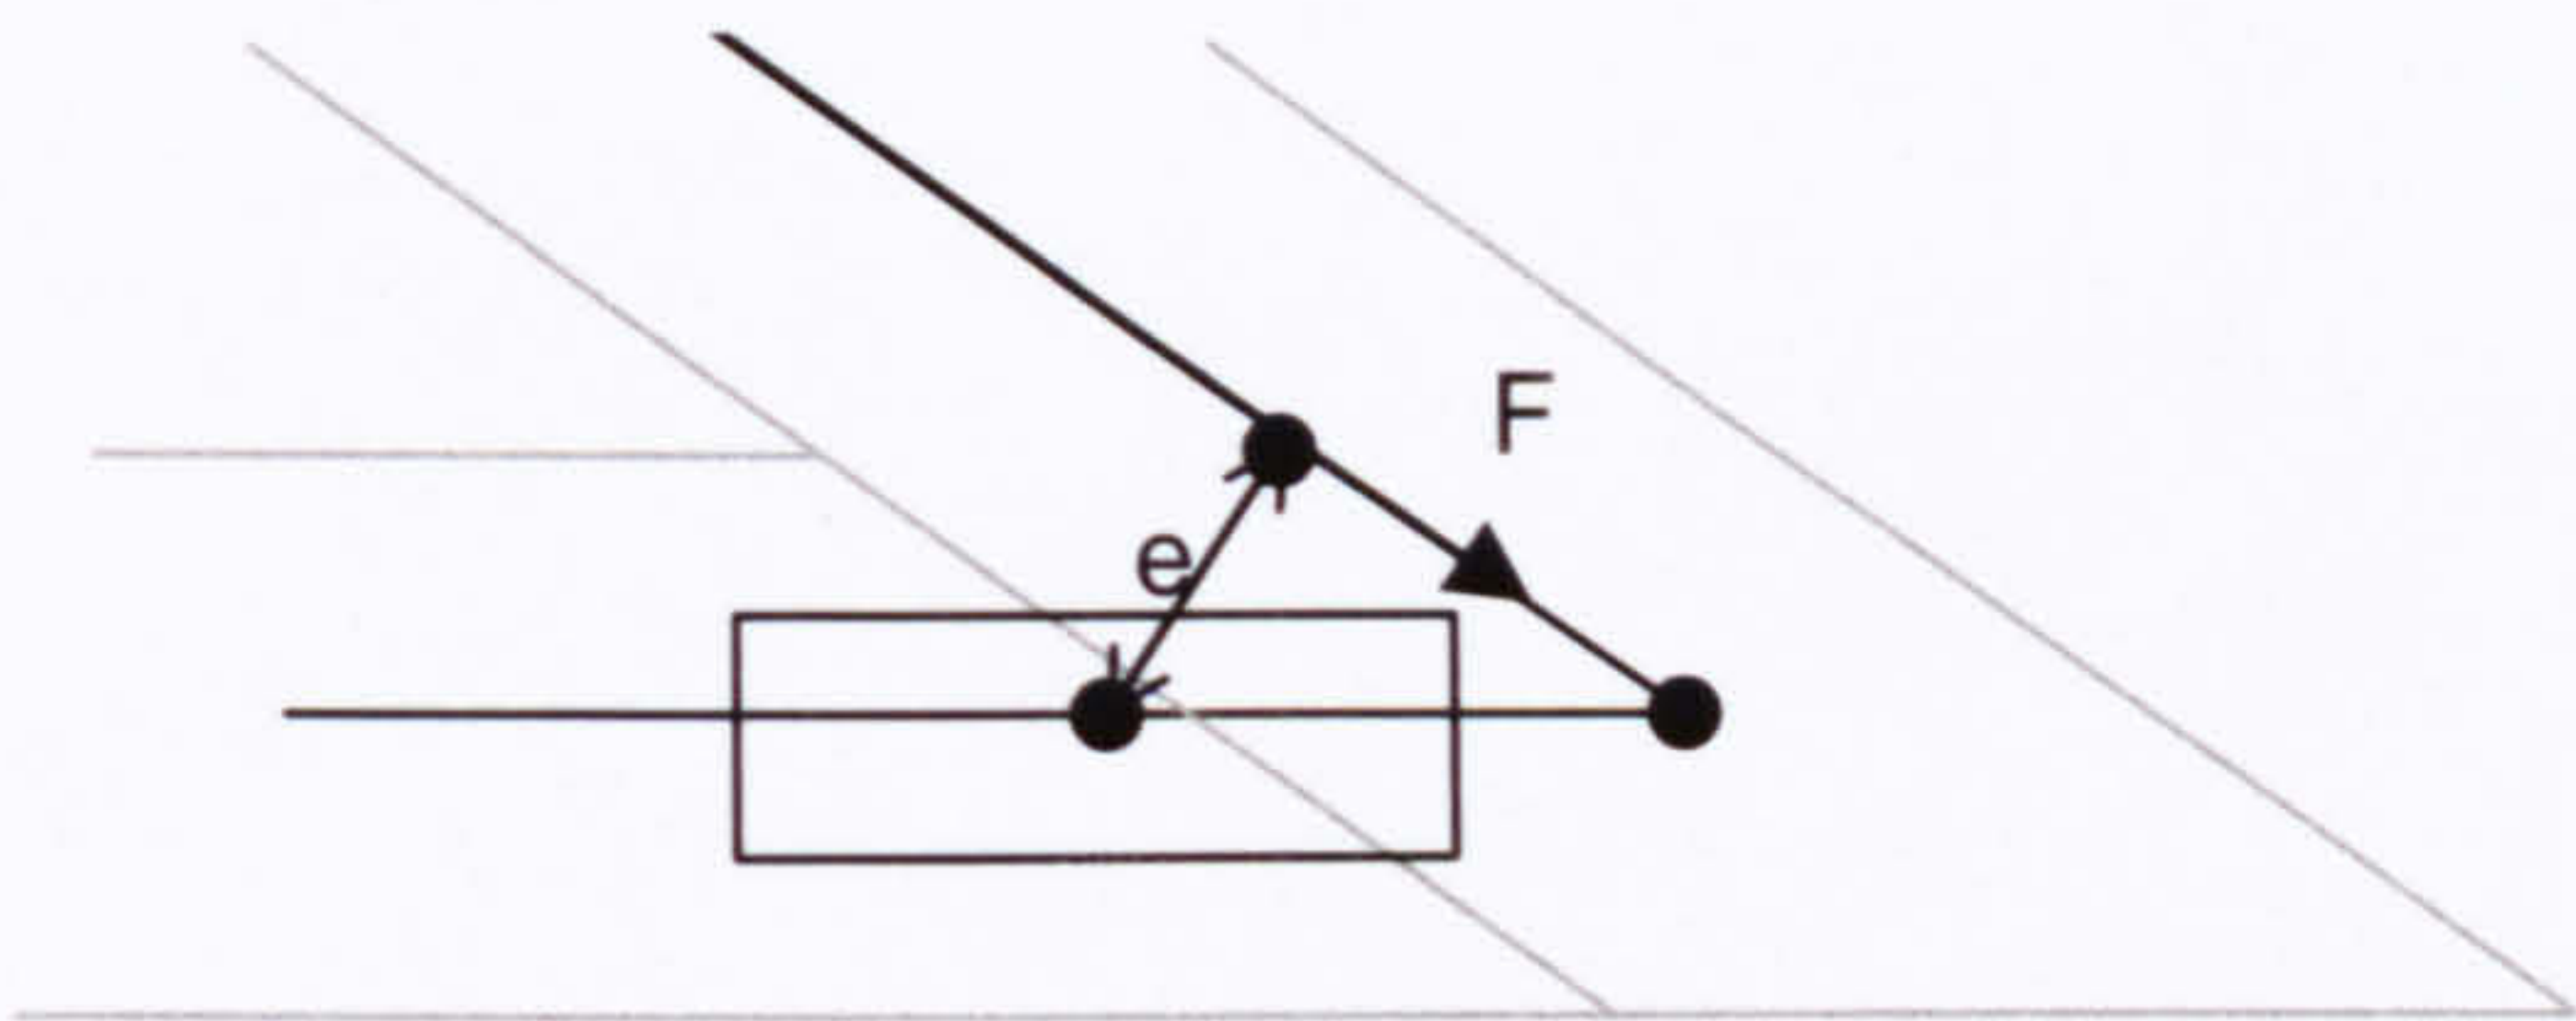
Modelling eccentricity in STRUSS
